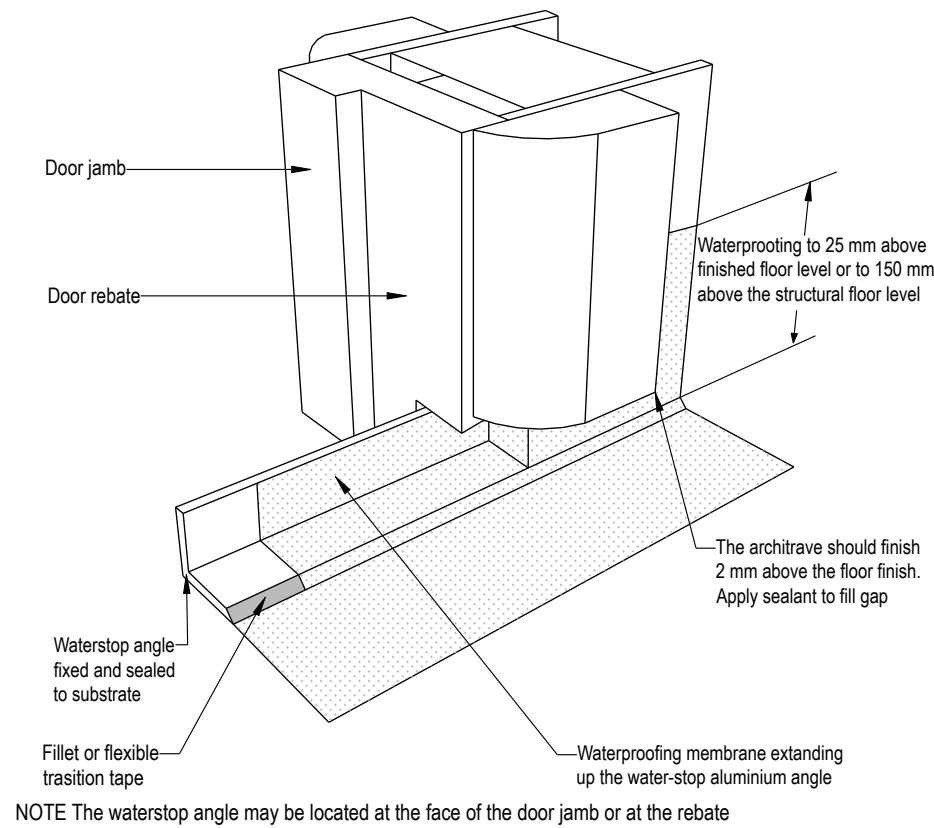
(A)- Example of liquid waterproofing at door opening framework
